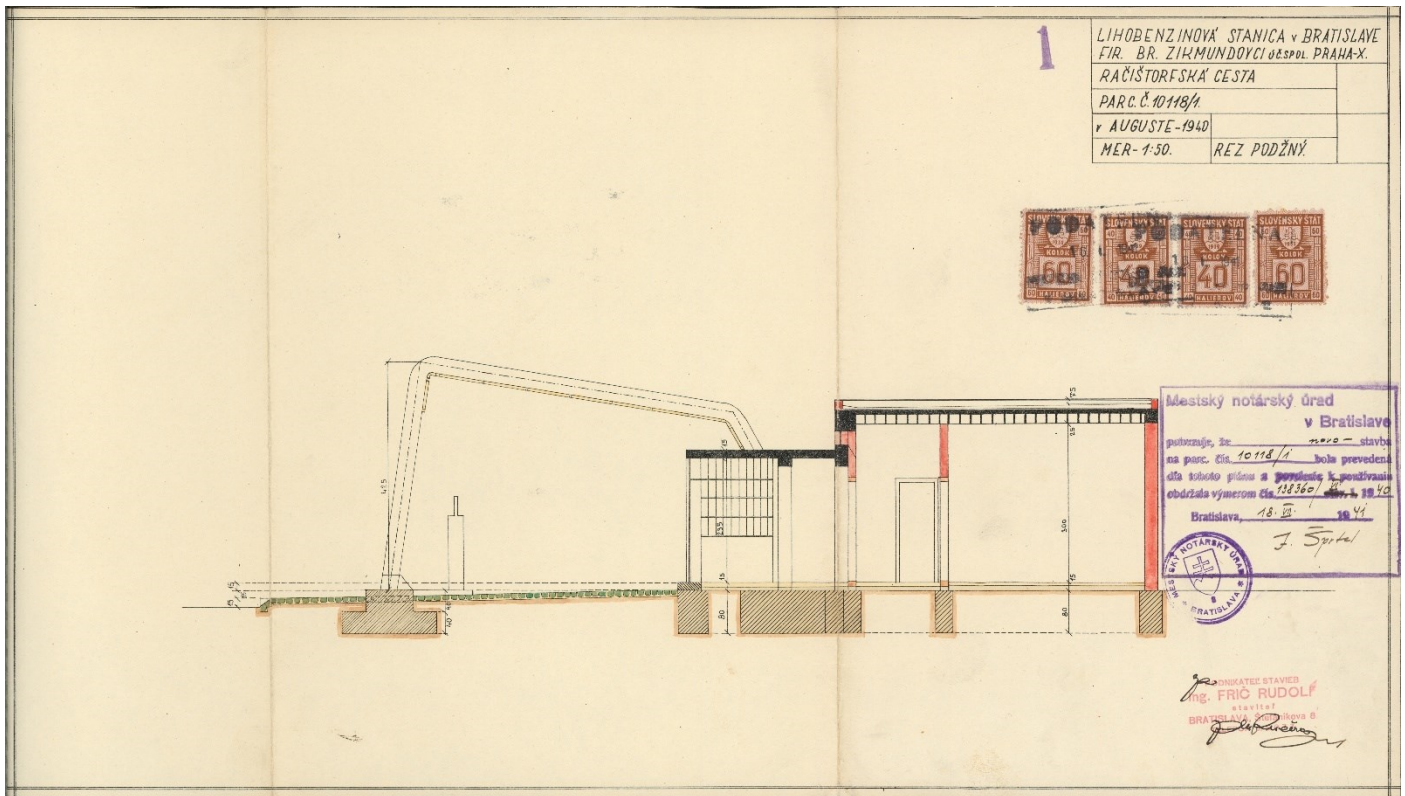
Jan Slavíček, The Zikmund Brothers' gas station, Račianska Street, Bratislava, 1940. Cross section. (Source: Bratislava City Archives, 1940)
